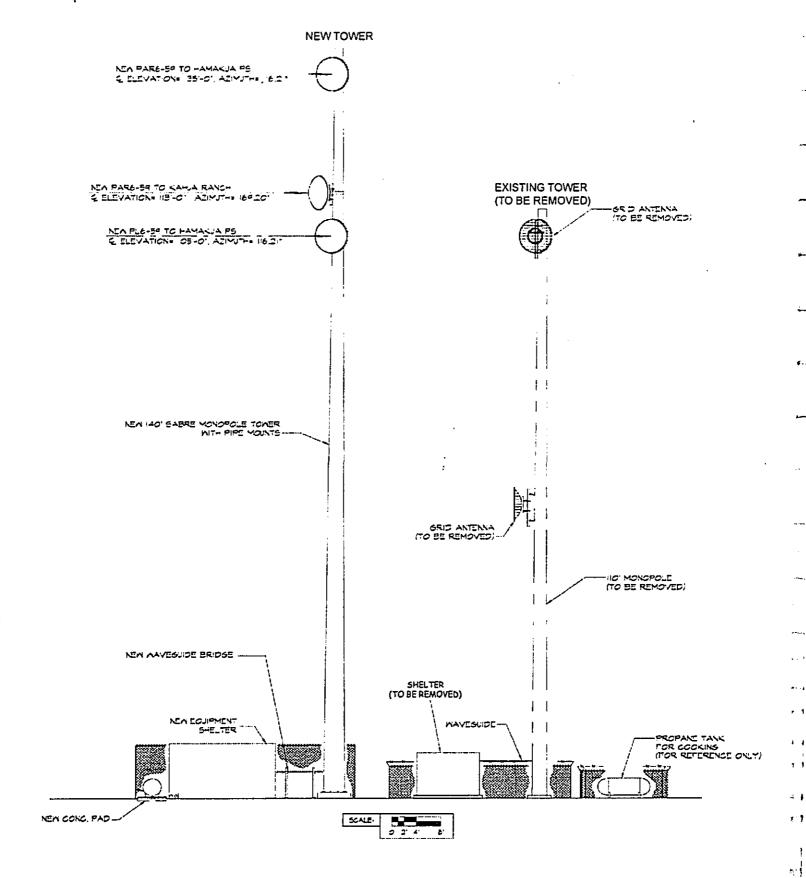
E Kamehameha Park / Elevation Plan (looking west)
